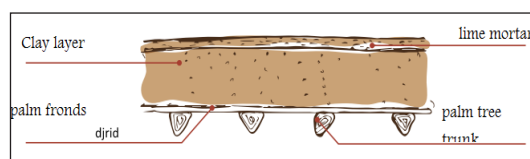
Flat floors made of palm trunks and branches. Source : A.Baghabga. 2013
